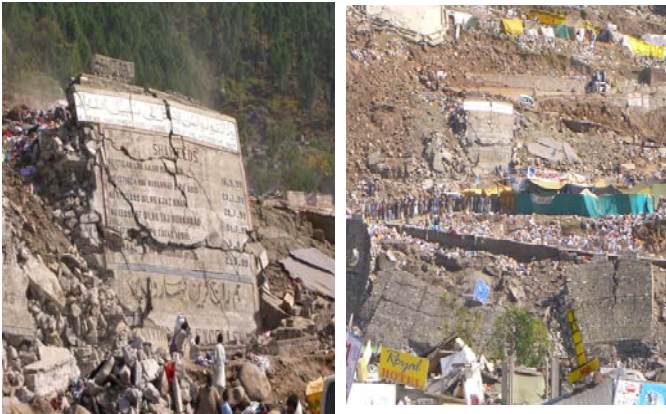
Damage to retaining walls in worst hit areas.
